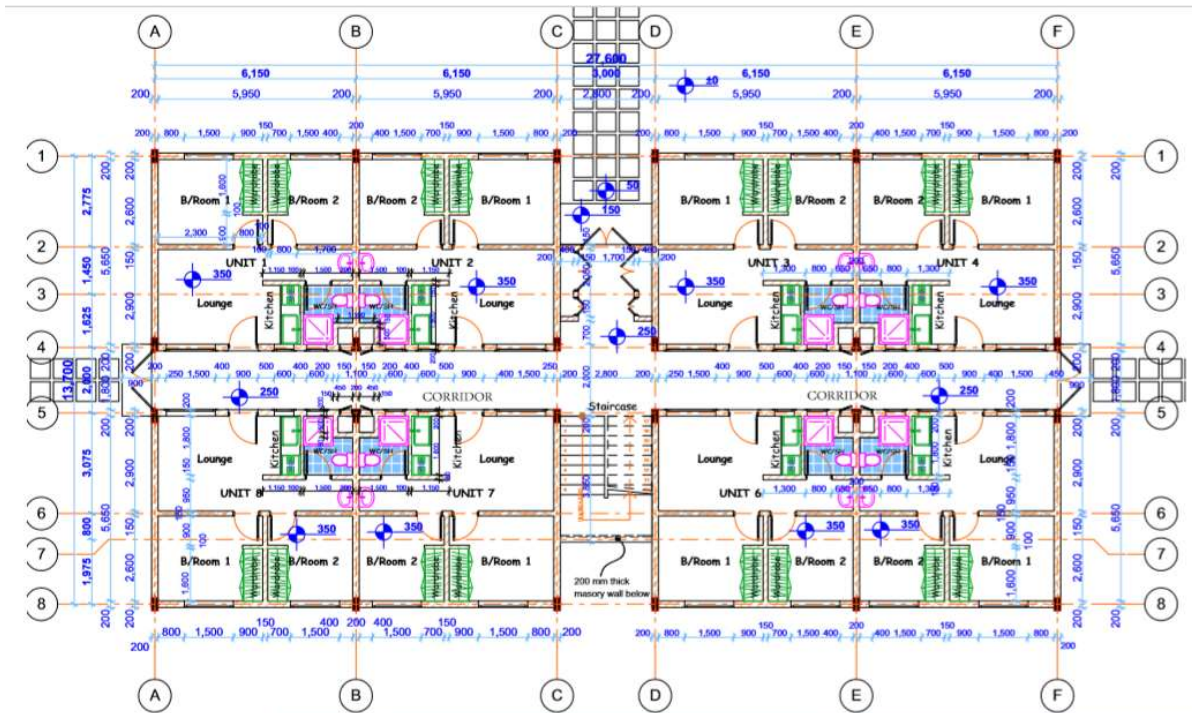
Ground Floor Plan of Proposed Affordable Units
